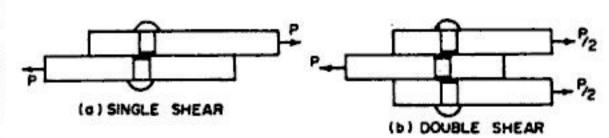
SHEAR FAILURE OF RIVET
